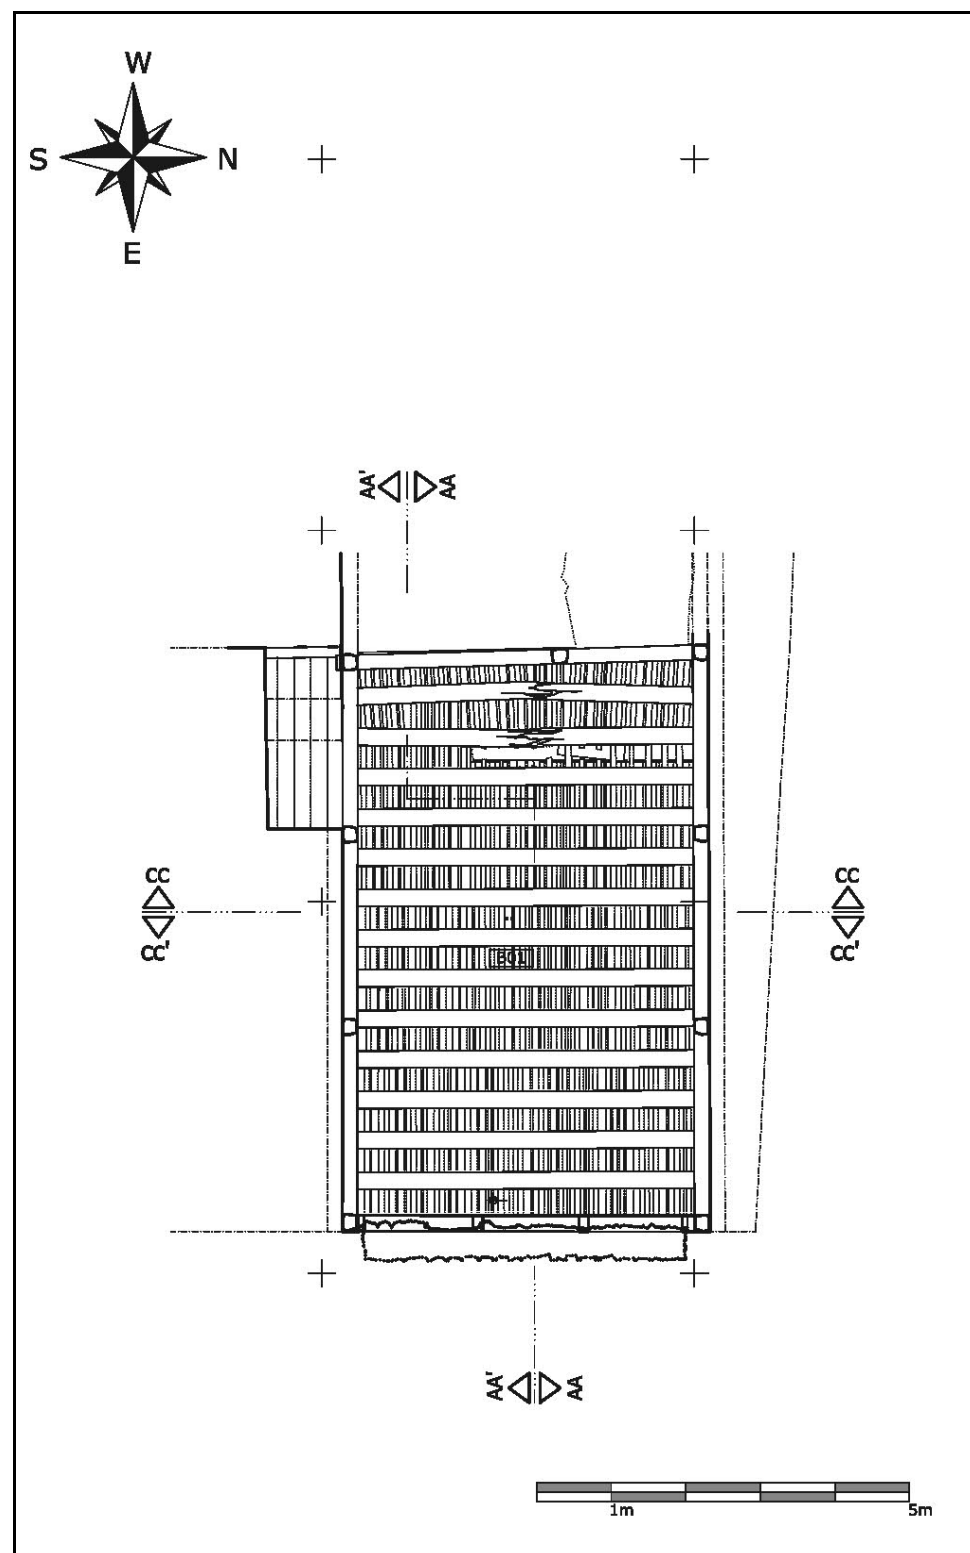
Basement Floor Reflected Ceiling Plan: 1/100 (presented in 1/50 at Jury)
